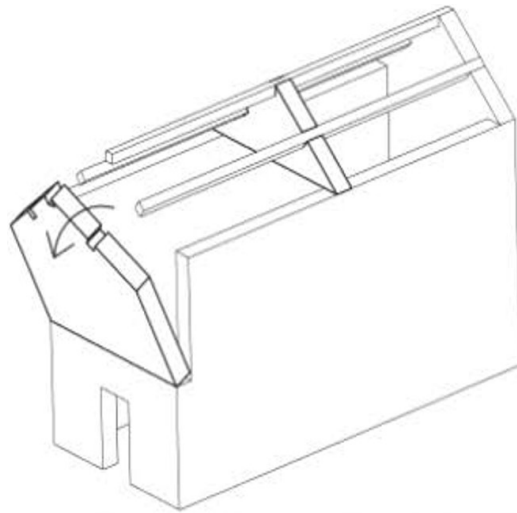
Tilting of the wall triangles around inclined axes. Tipping of the spandrel in a gable roof. The mechanism occurs when the anchorage between the tympanum and the roof is insufficient or the roof beams are not braced. The beams, without straps or other connecting elements, do not retain the gable. If the masonry does not collapse, it will be damaged at the end of the beams.
